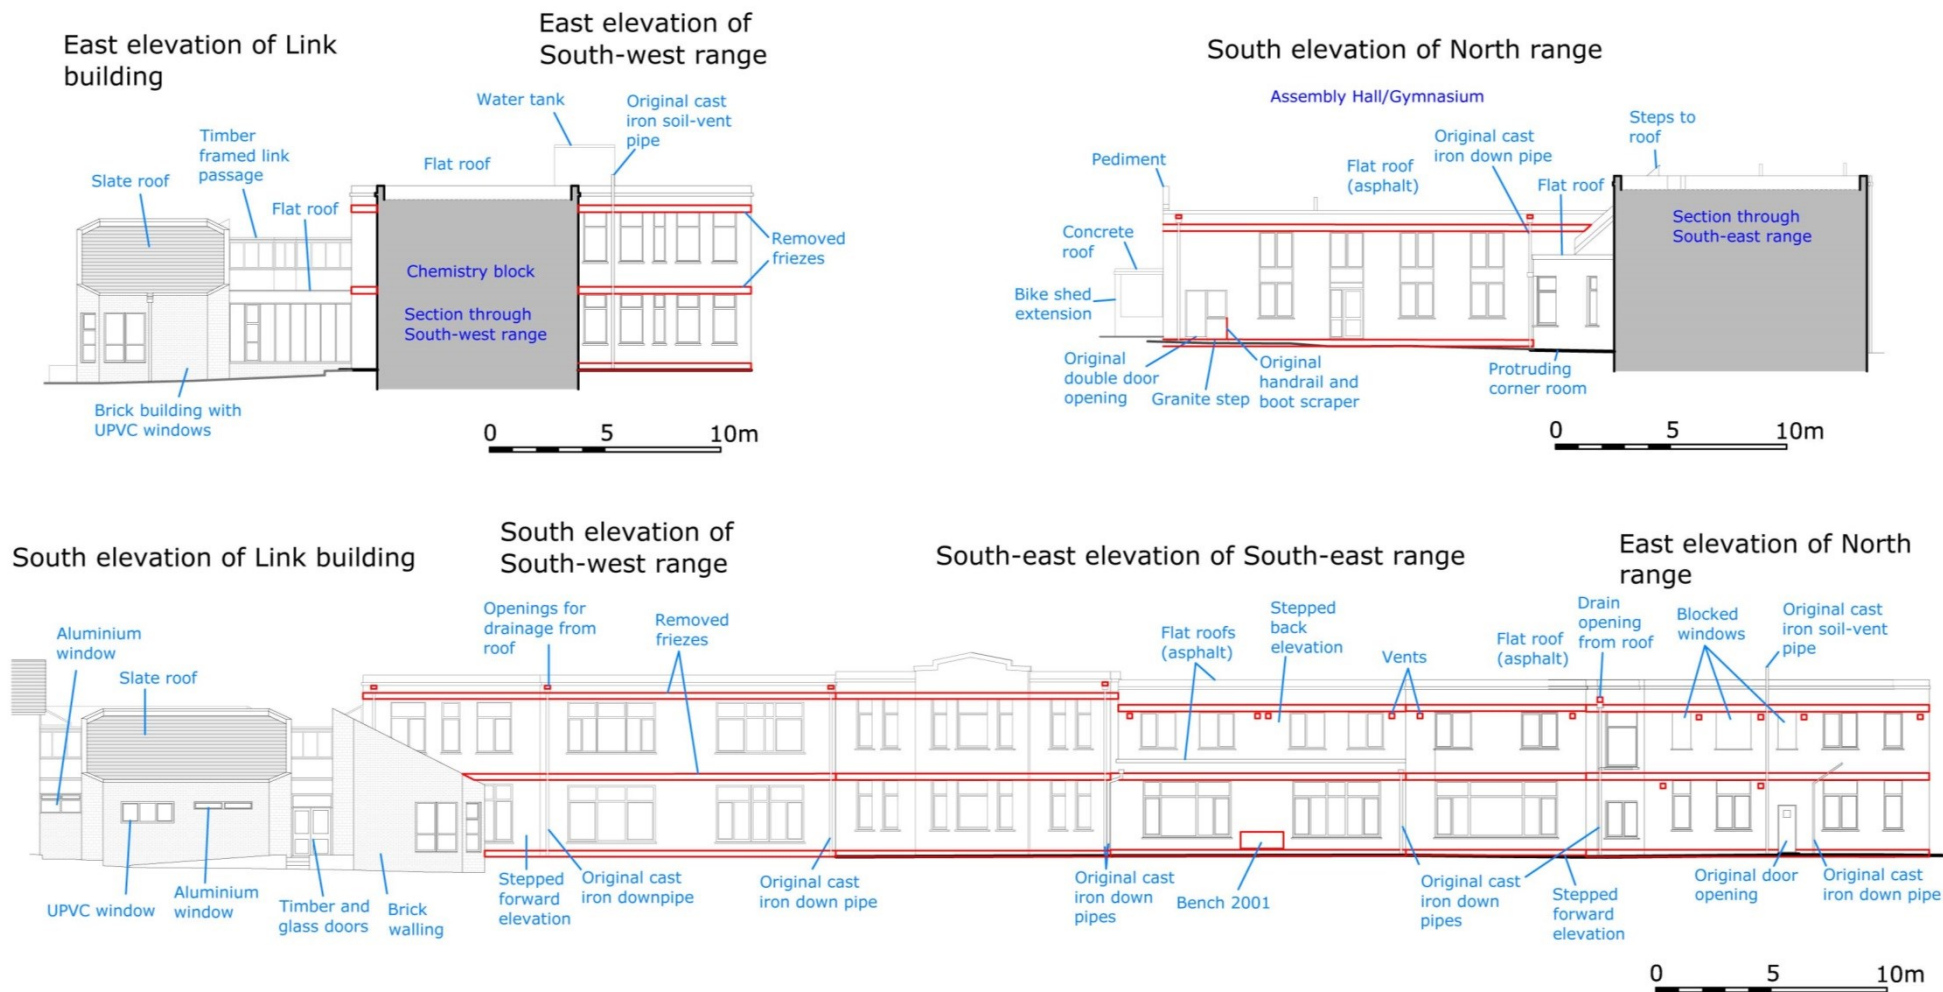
East, south-east and south elevations of Quadrangle and Link Building.
